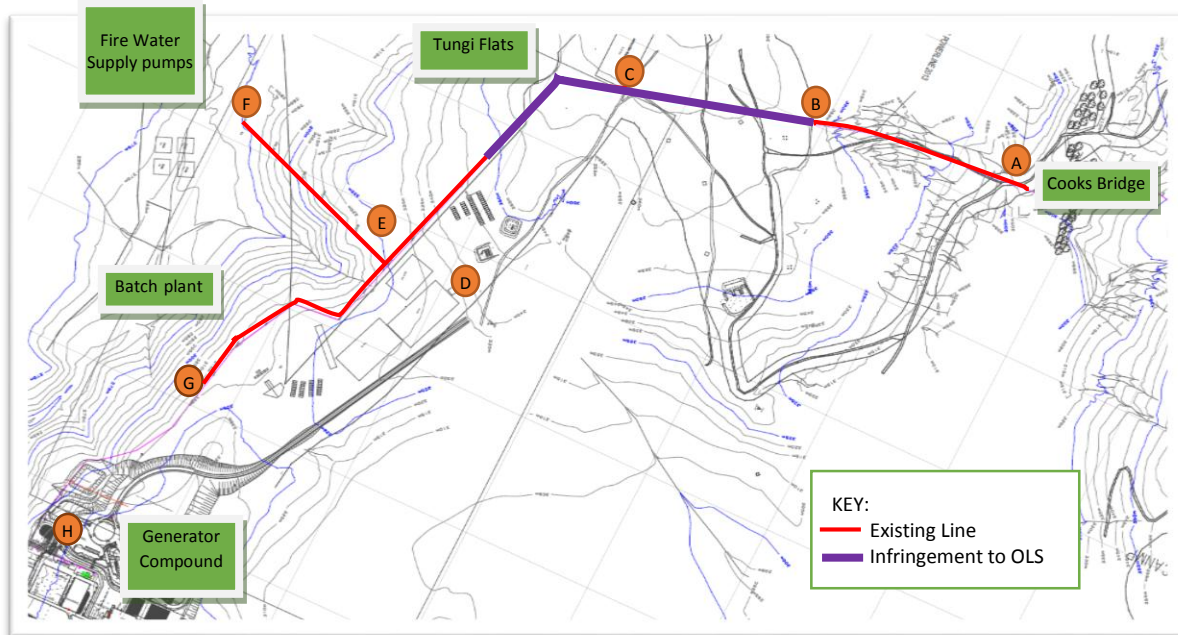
below shows a section of the electricity lines between Cooks Bridge and Bradleys. It should be noted that planning approval has already been given for these.
